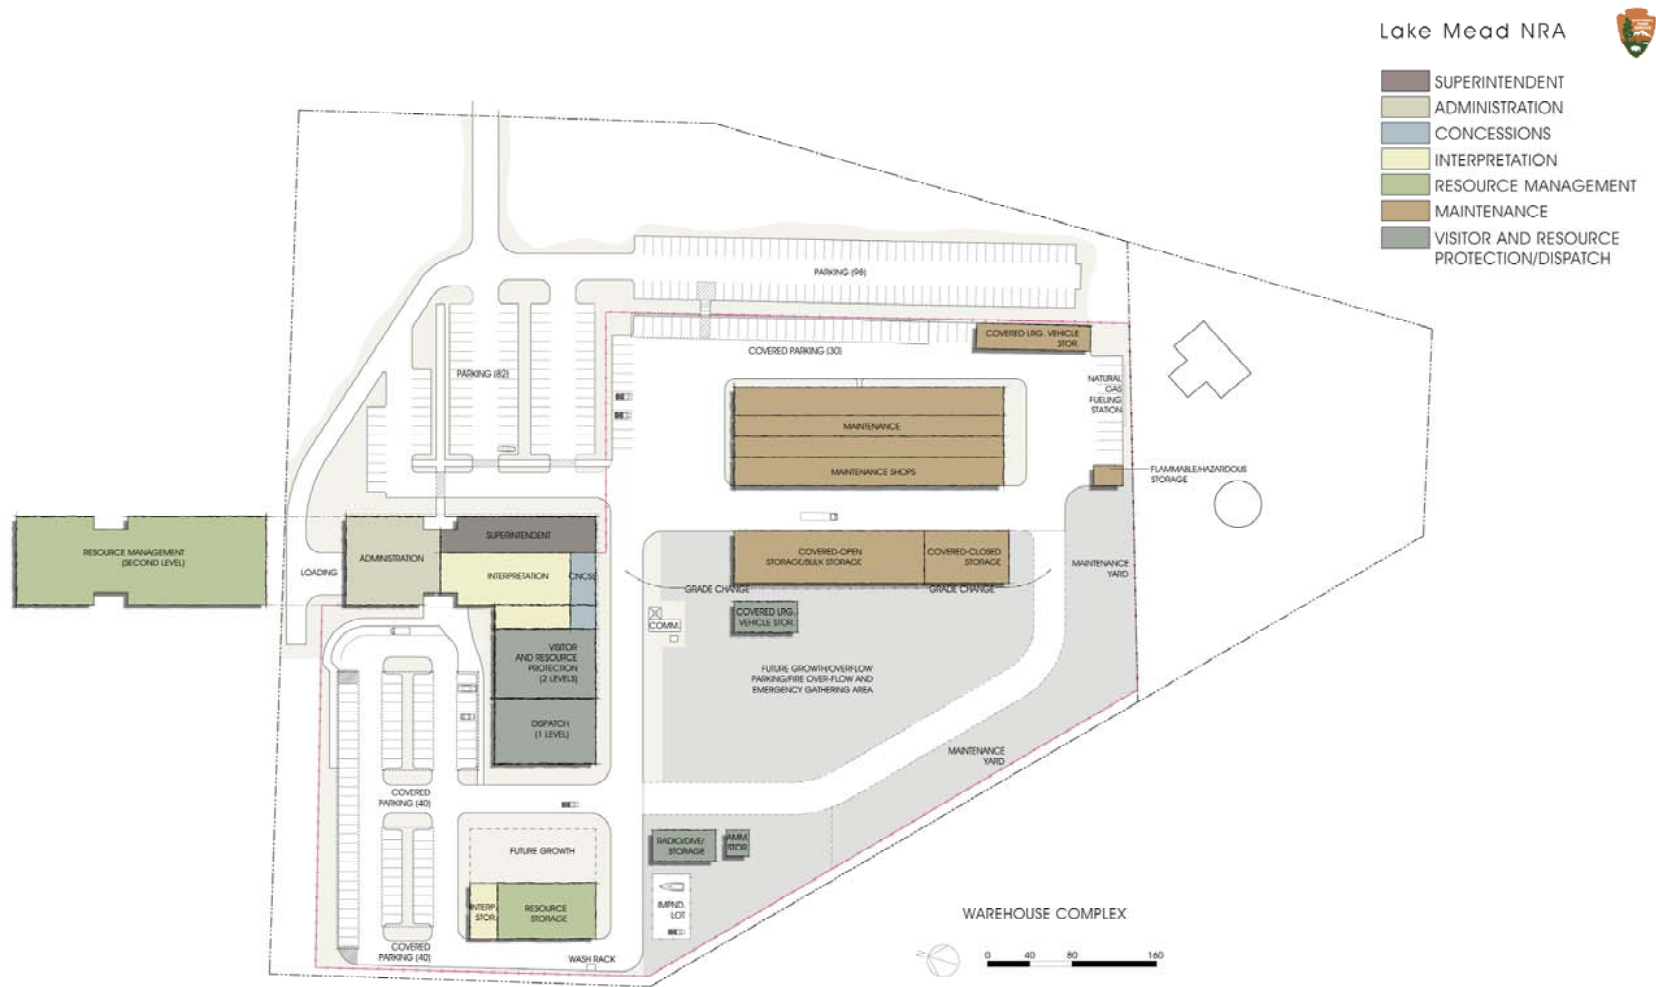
Schematic design of the Warehouse site under Alternative B (*courtesy of ajc architects, 2007*).
